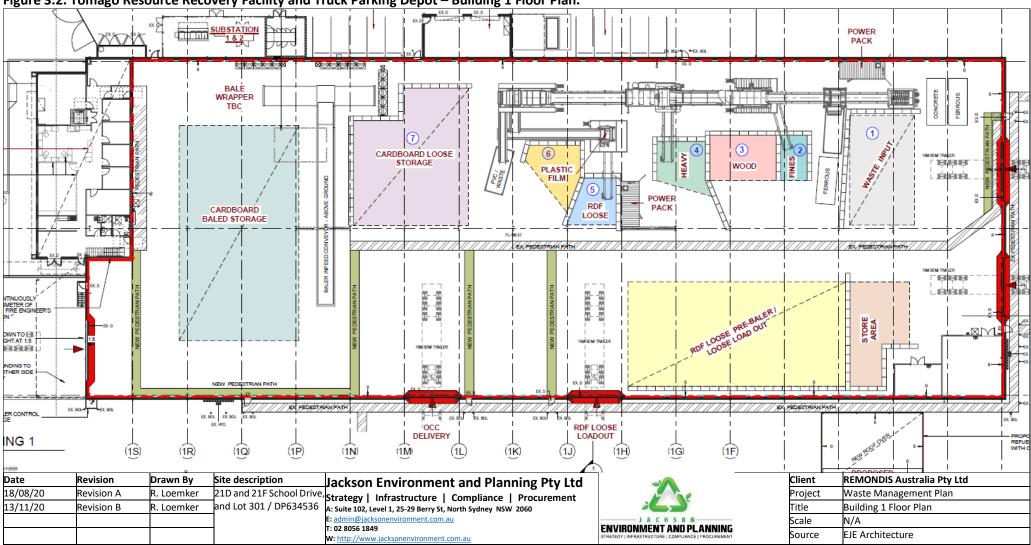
Tomago Resource Recovery Facility and Truck Parking Depot – Building 1 Floor Plan.
